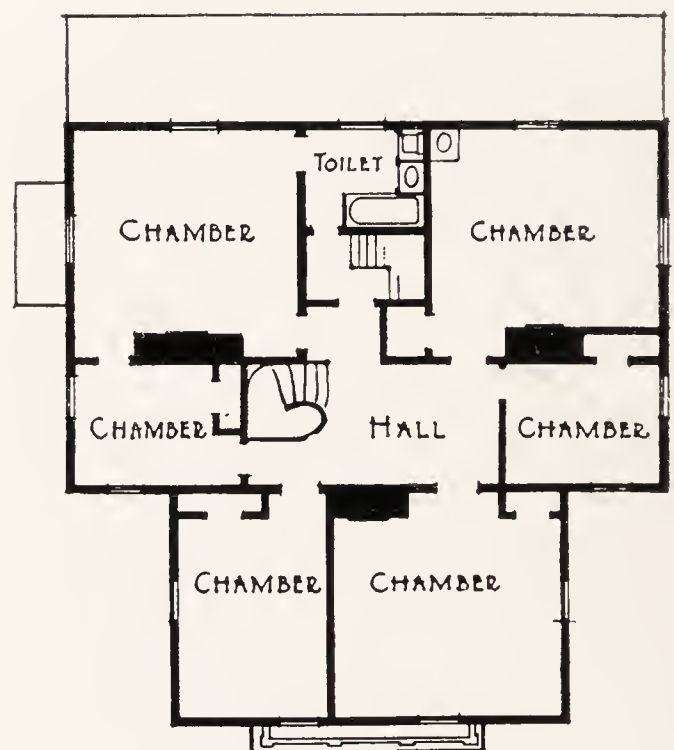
SECOND FLOOR OF CHOATE HOMESTEAD
